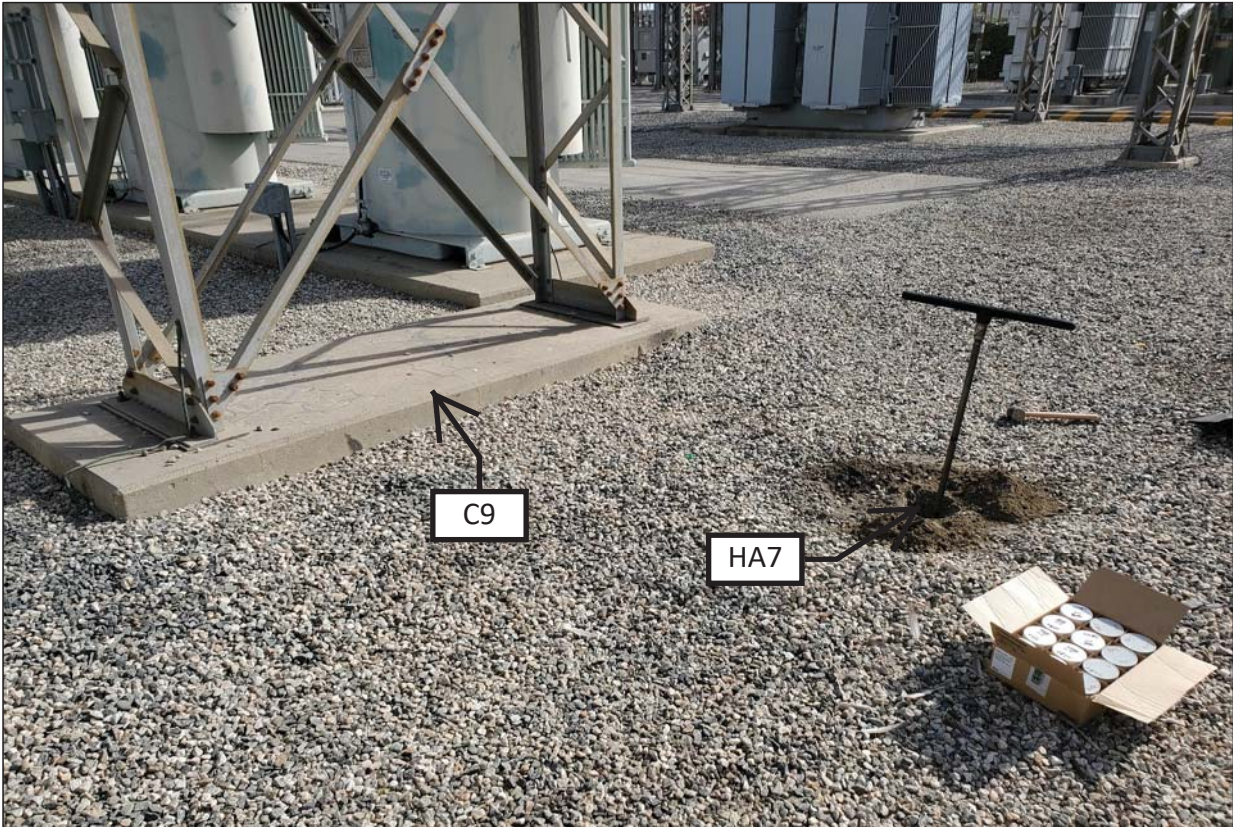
HAND AUGER LOCATION HA7 AND CONCRETE SAMPLE LOCATION C9
